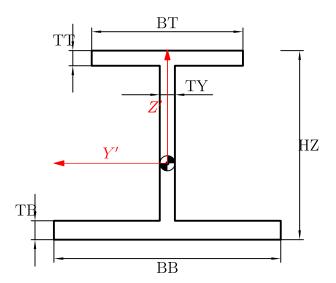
GIORH: Cross section dimensions in a Sesam GIORH profile section (used to model T sections).
